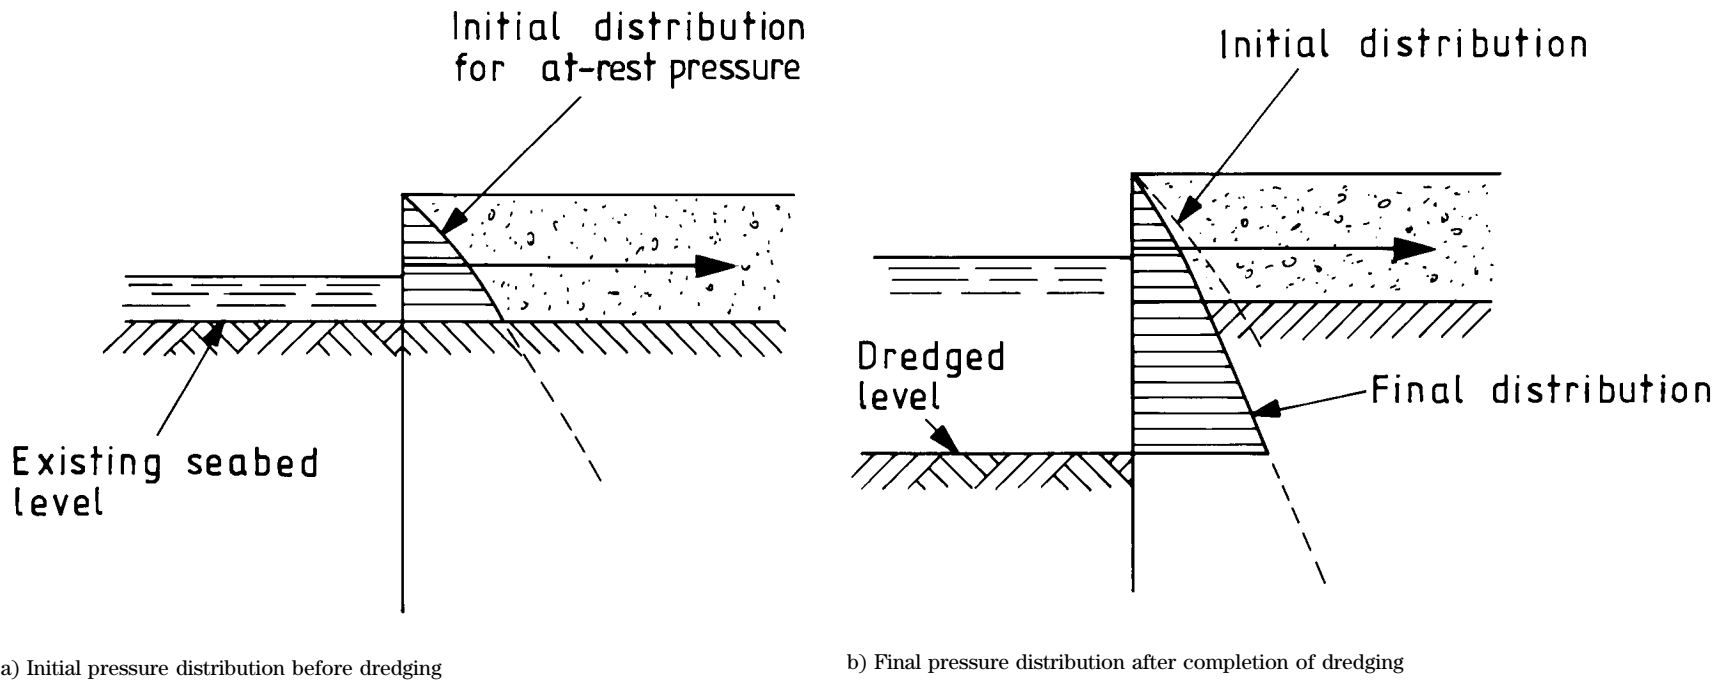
Active pressure distribution on anchored single-wall structure where filling is placed before dredging
